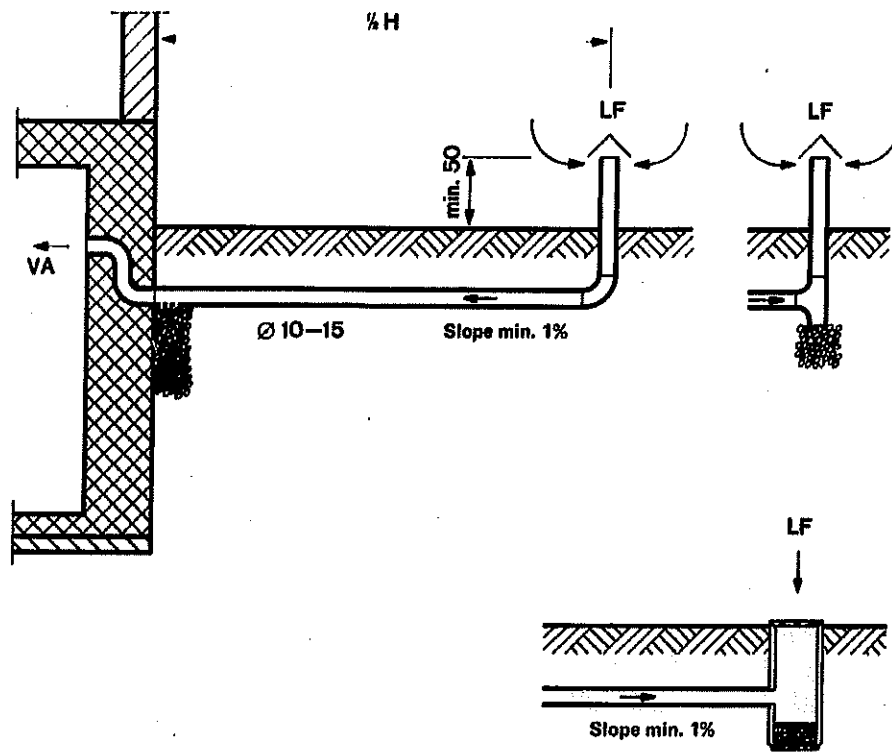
Air intake with pipes outside the area of falling debris.
